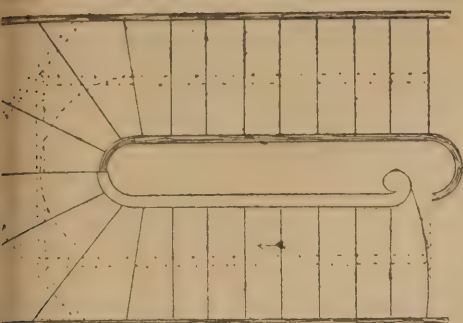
PLAN OF GEOMETRICAL STAIRS.
